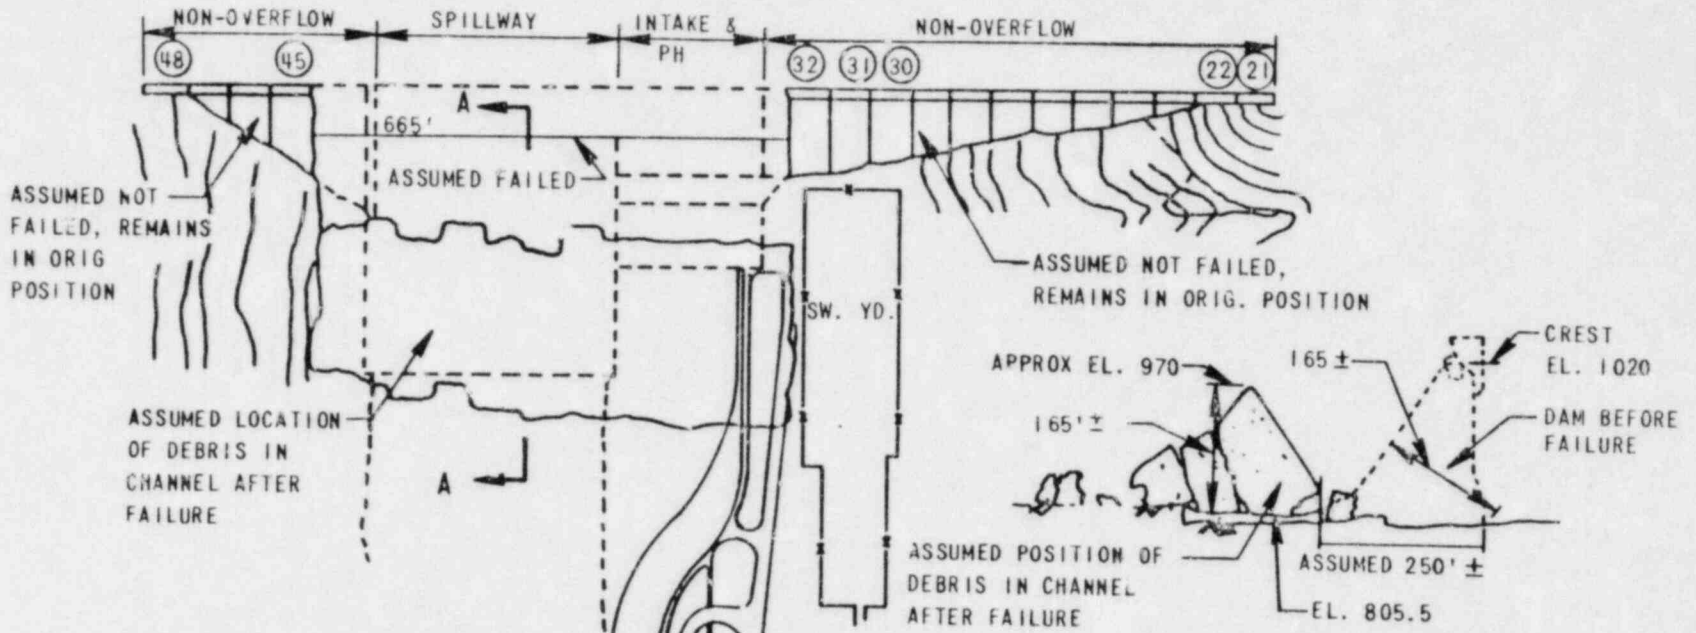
Norris Dam - Plan Elevations and Sections
